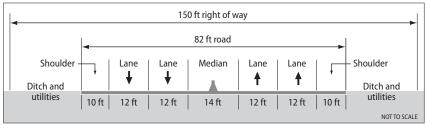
Typical right of way cross section of SR 502 under the Proposed Action
